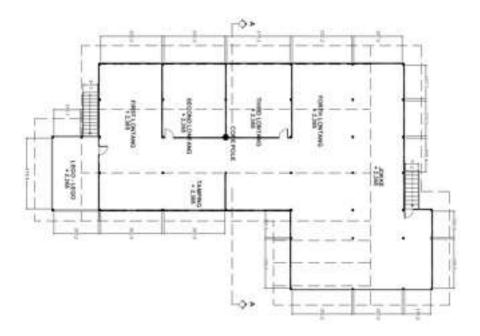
Z1-PR-10: Floorplan. Source: Field survey 2015
